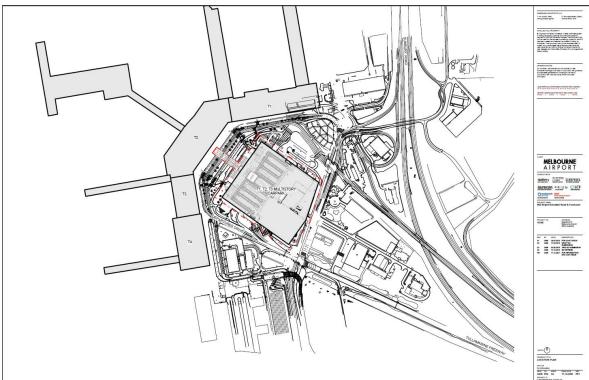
Naarm Way Stage 2 Project MDP design – ERF Bridge Link connecting the T123 carpark to Terminal Departures. Source: Melbourne Airport Elevated Road & Forecourt Stage 2 Project MDP (October 2021)
